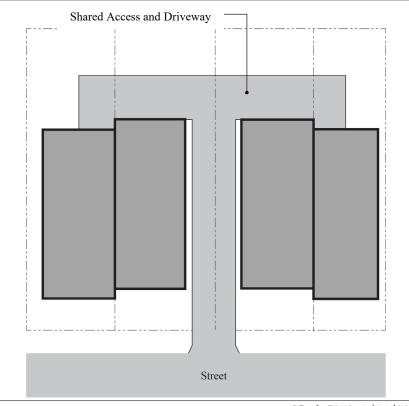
Townhouses on Corner Lot with Shared Access
